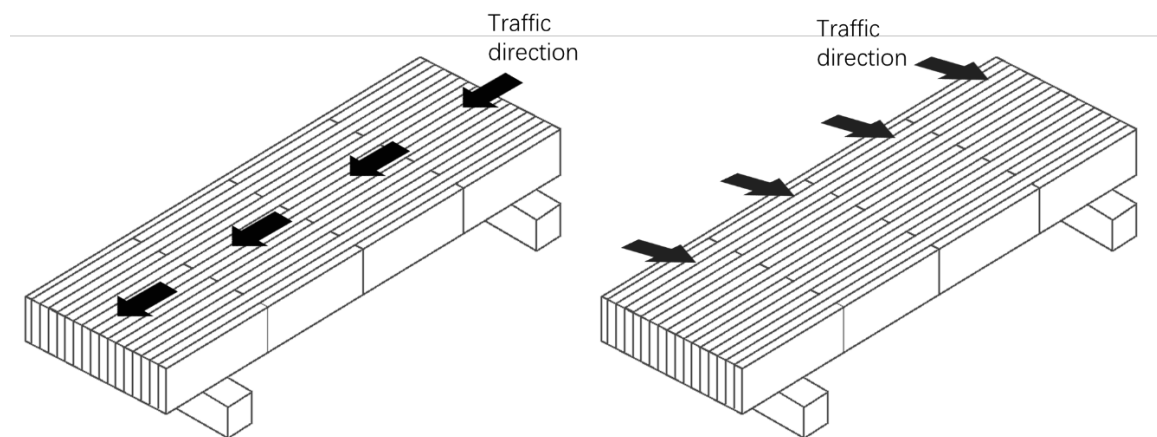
Longitudinal (left) and Transverse (right) NLT timber bridge deck
